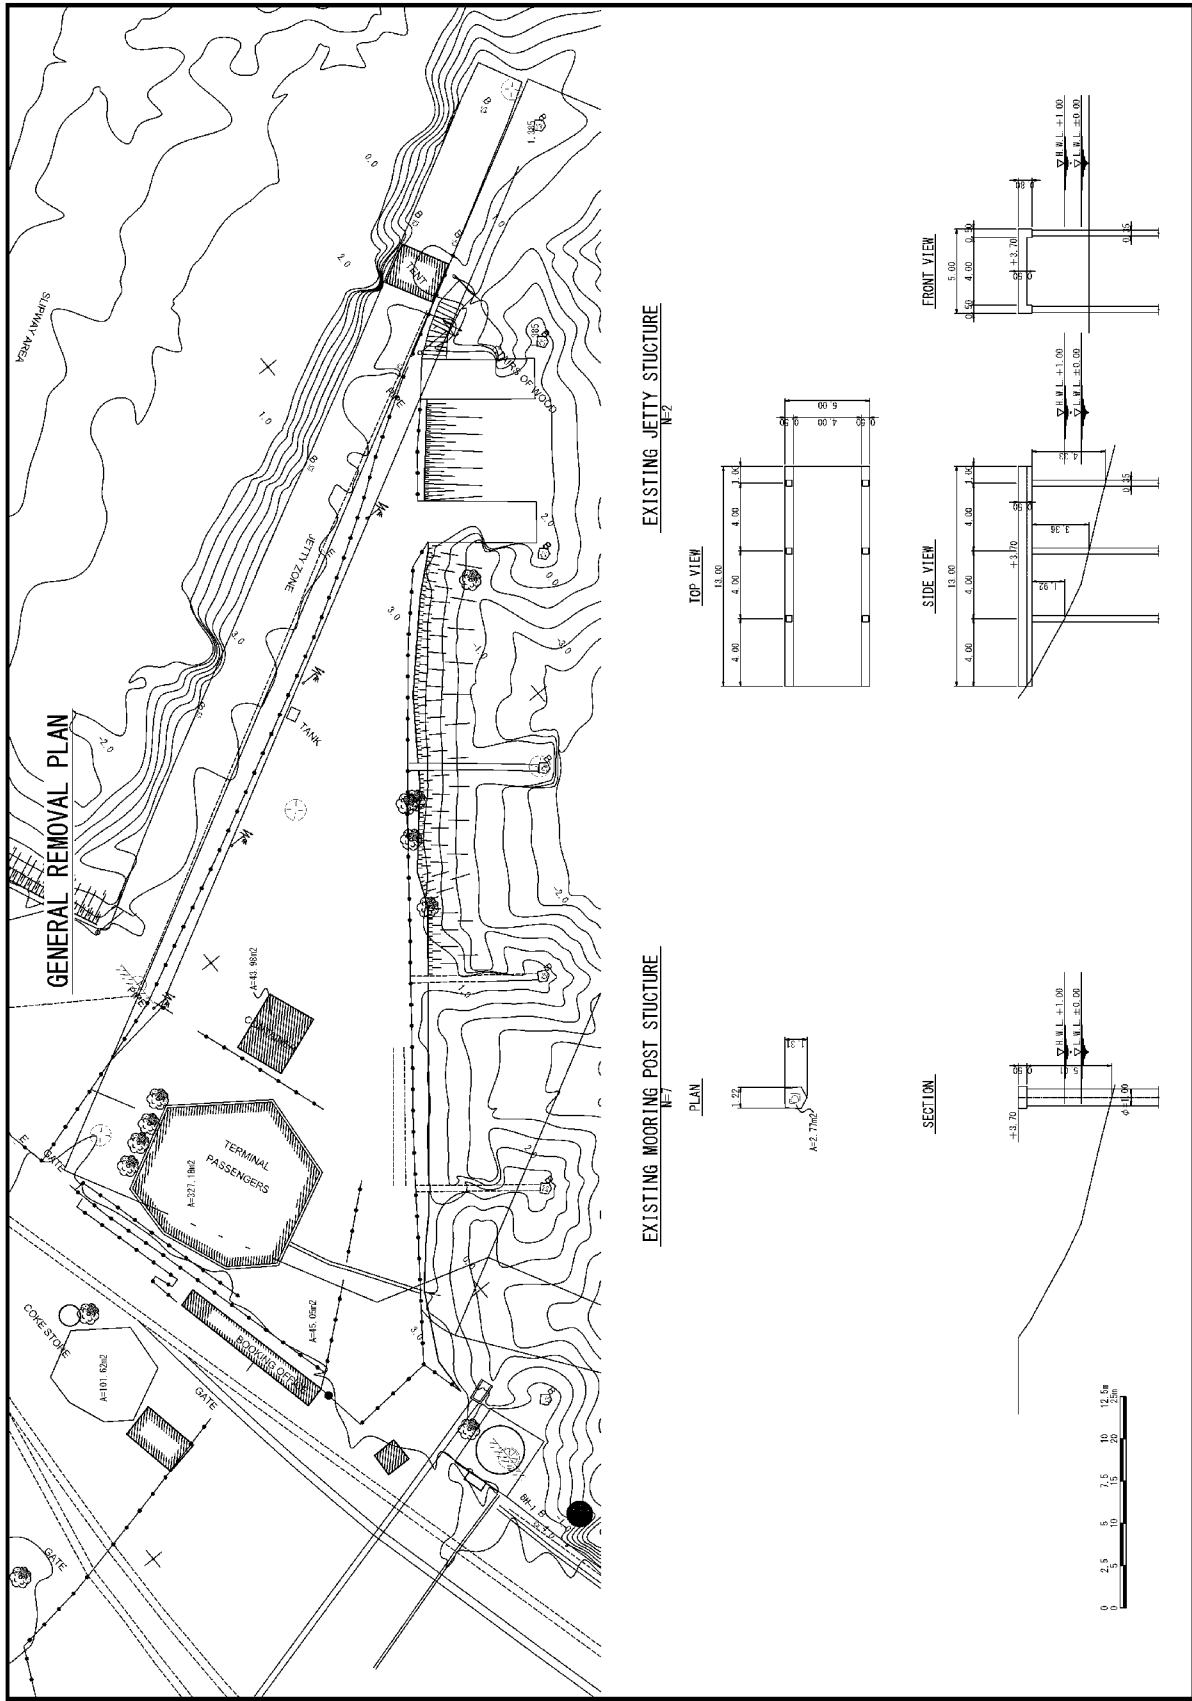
General Removal Plan of Existing Facilities
